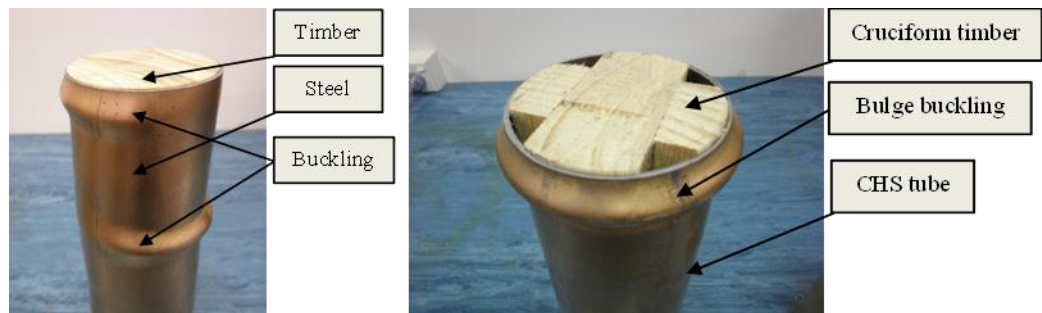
Fully timber filled specimen TIMC.5 (left), and cruciform timber filled specimen TIMC.6 (right) after failure.
